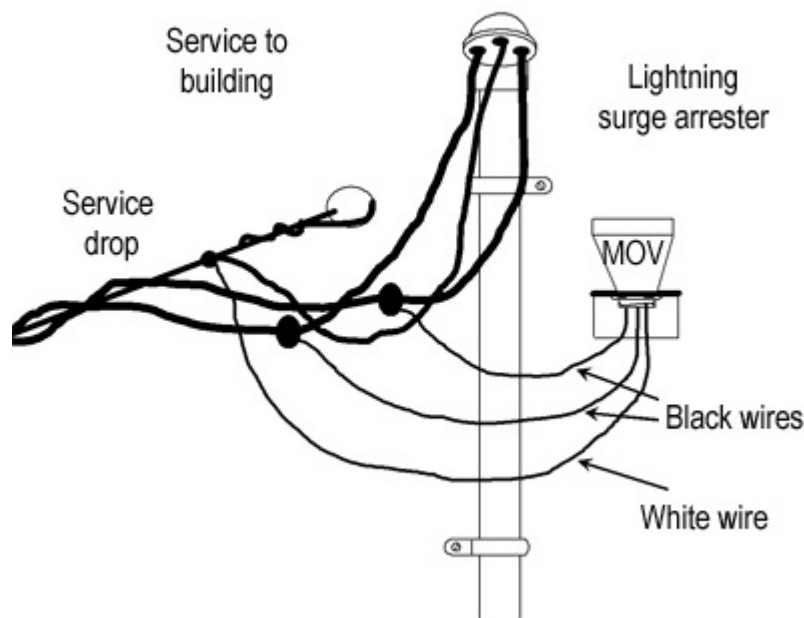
A surge arrester installed at a service entrance to a building provides a direct path to ground.
